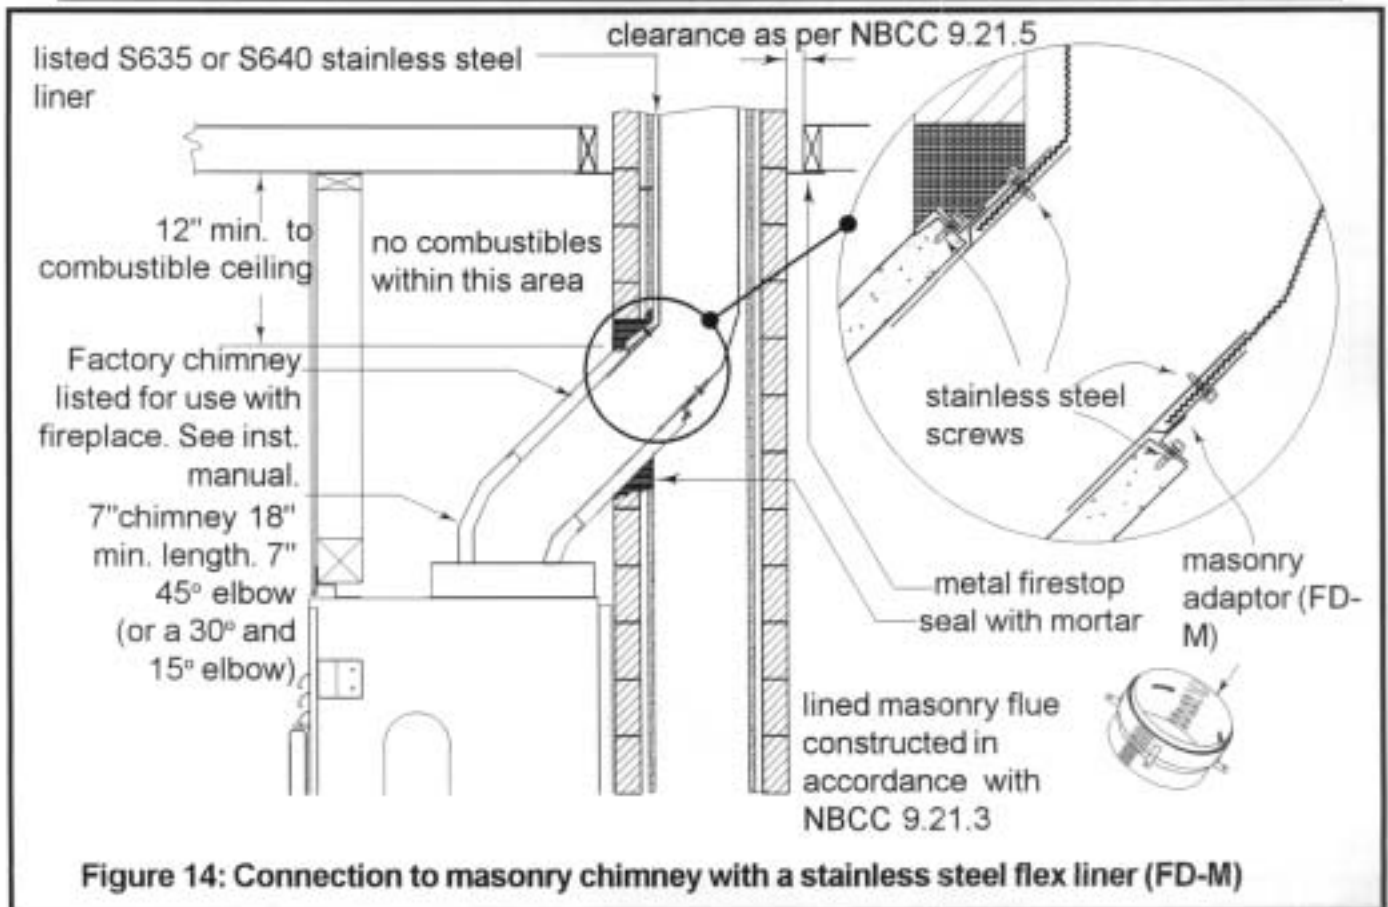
Connection to masonry chimney with a stainless steel flex liner (FD-M)
